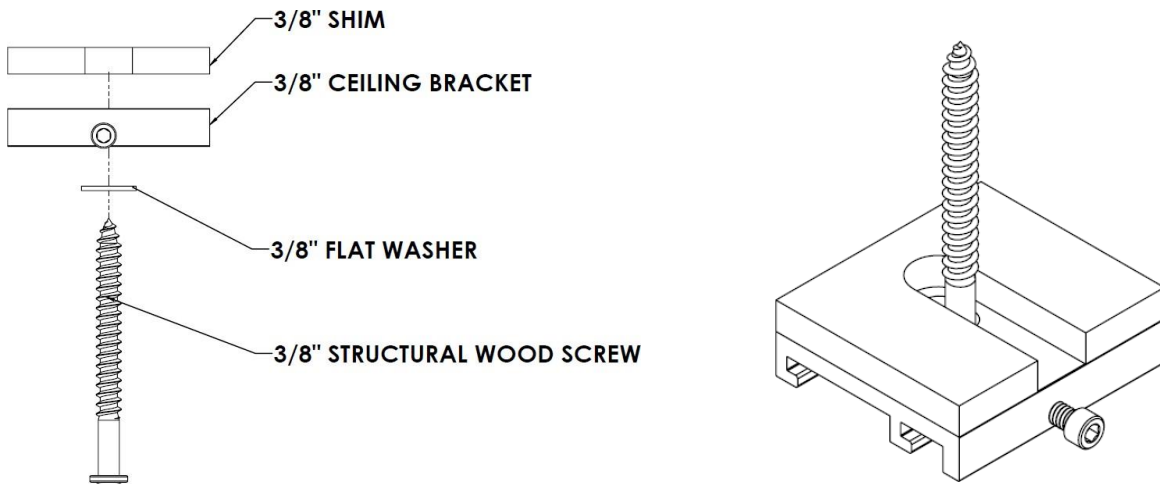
Wood Framing Bottom-Up Installation, Standard Mount—Structural Wood Screws and Joists (Detail)
